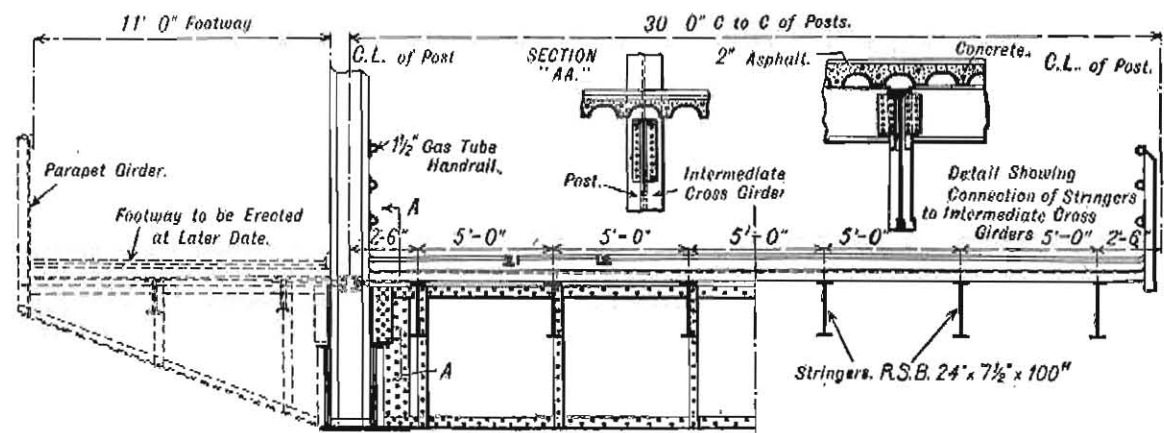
CROSS SECTION OF ROADWAY OF BRIDGE
